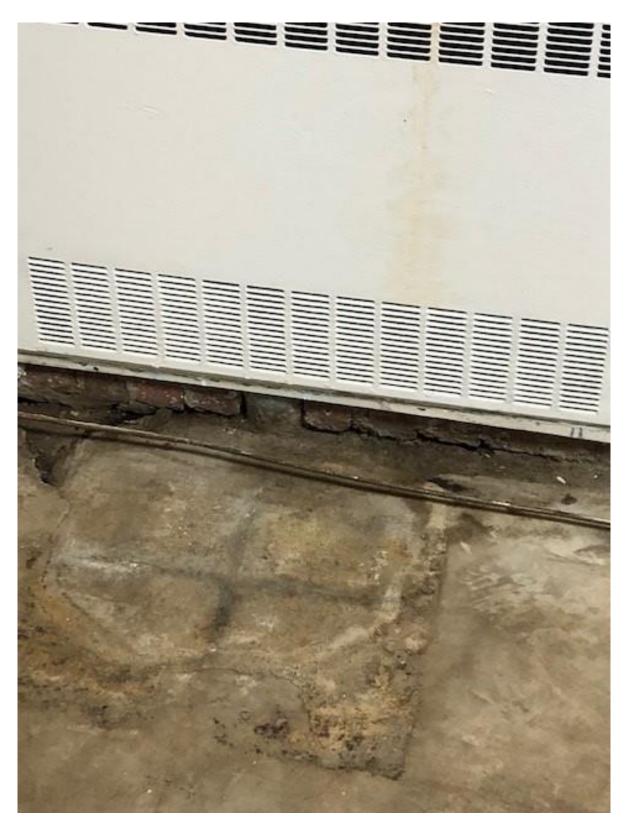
POST ASBESTOS ABATEMENT FLOOR & BRICK IN FACULTY ROOM
